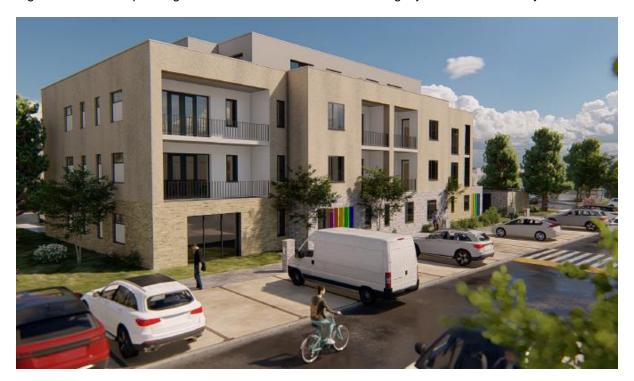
3d Image of proposed creche facility at ground floor within Block F.
